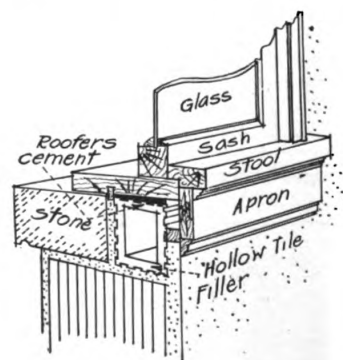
A Cut Stone Sill Used in Connection with Hollow Tile
